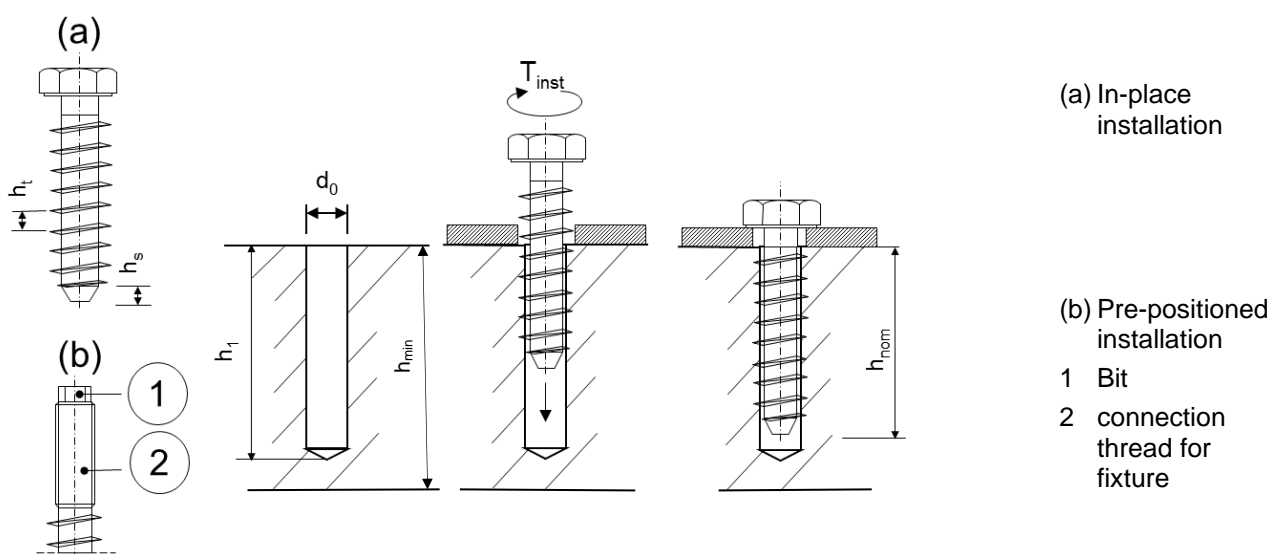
Screw anchor: Geometry and drill hole parameter
